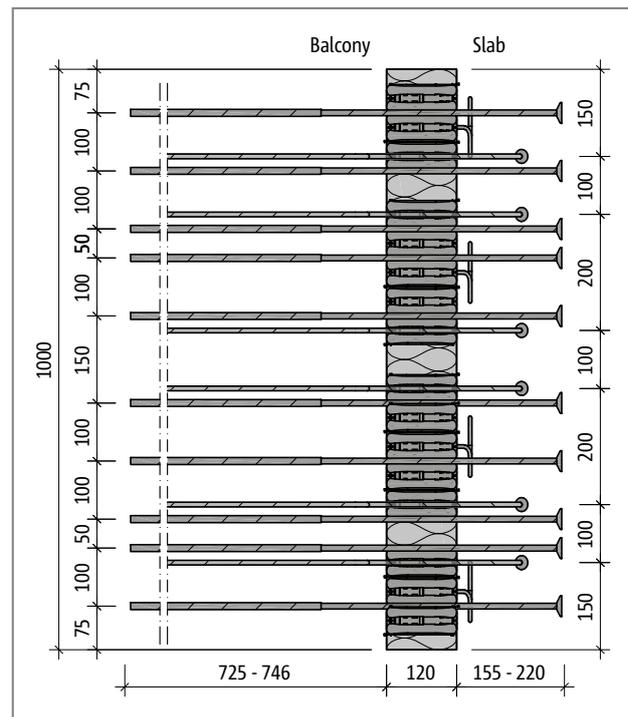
Schöck Isokorb® XT type K-U-M4: Product plan view
